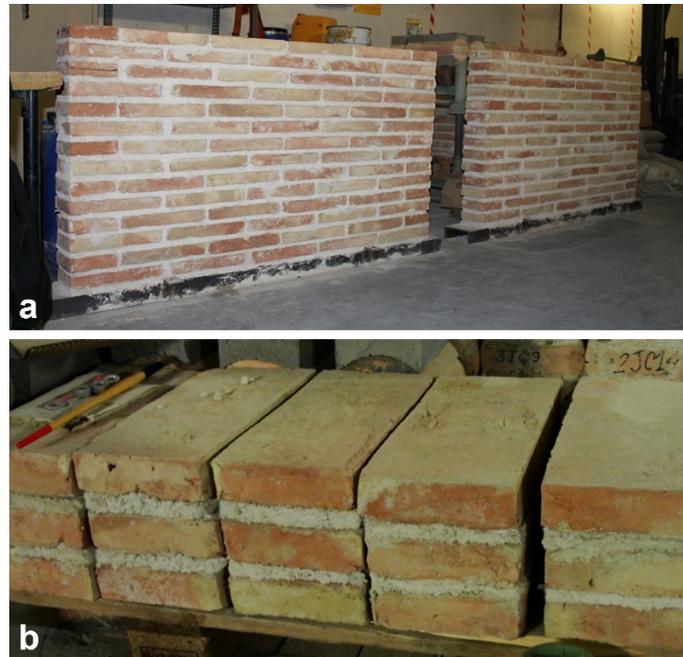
Prismatic specimens of masonry built in the laboratory: a) walls and b) triplets.
